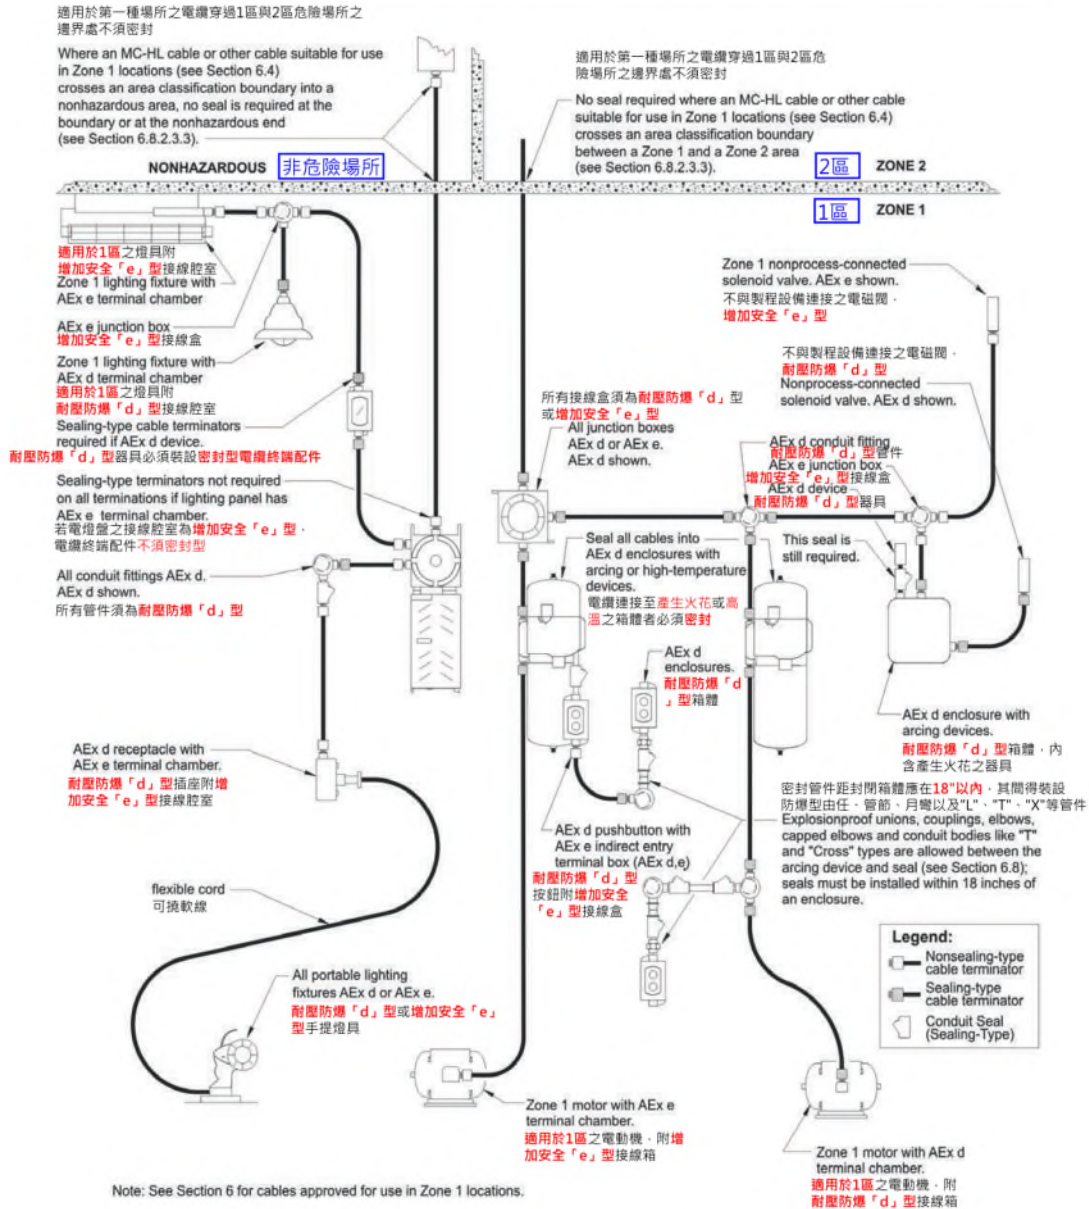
Typical Class I, Zone 1 or Zone 2 Electrical Installation Cable System Utilizing Class I, Zone 1 Equipment and Wiring Methods
